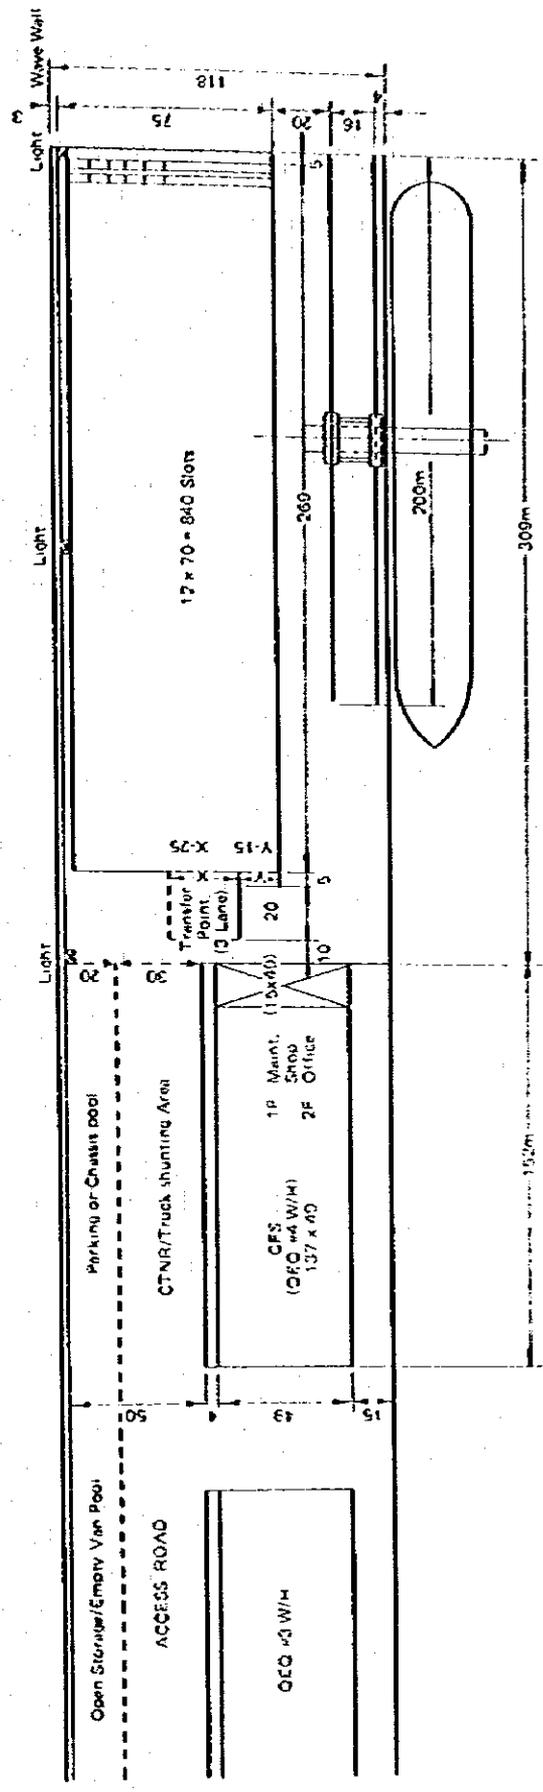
Layout of Korteboom Container Terminal (Urgent Plan)
